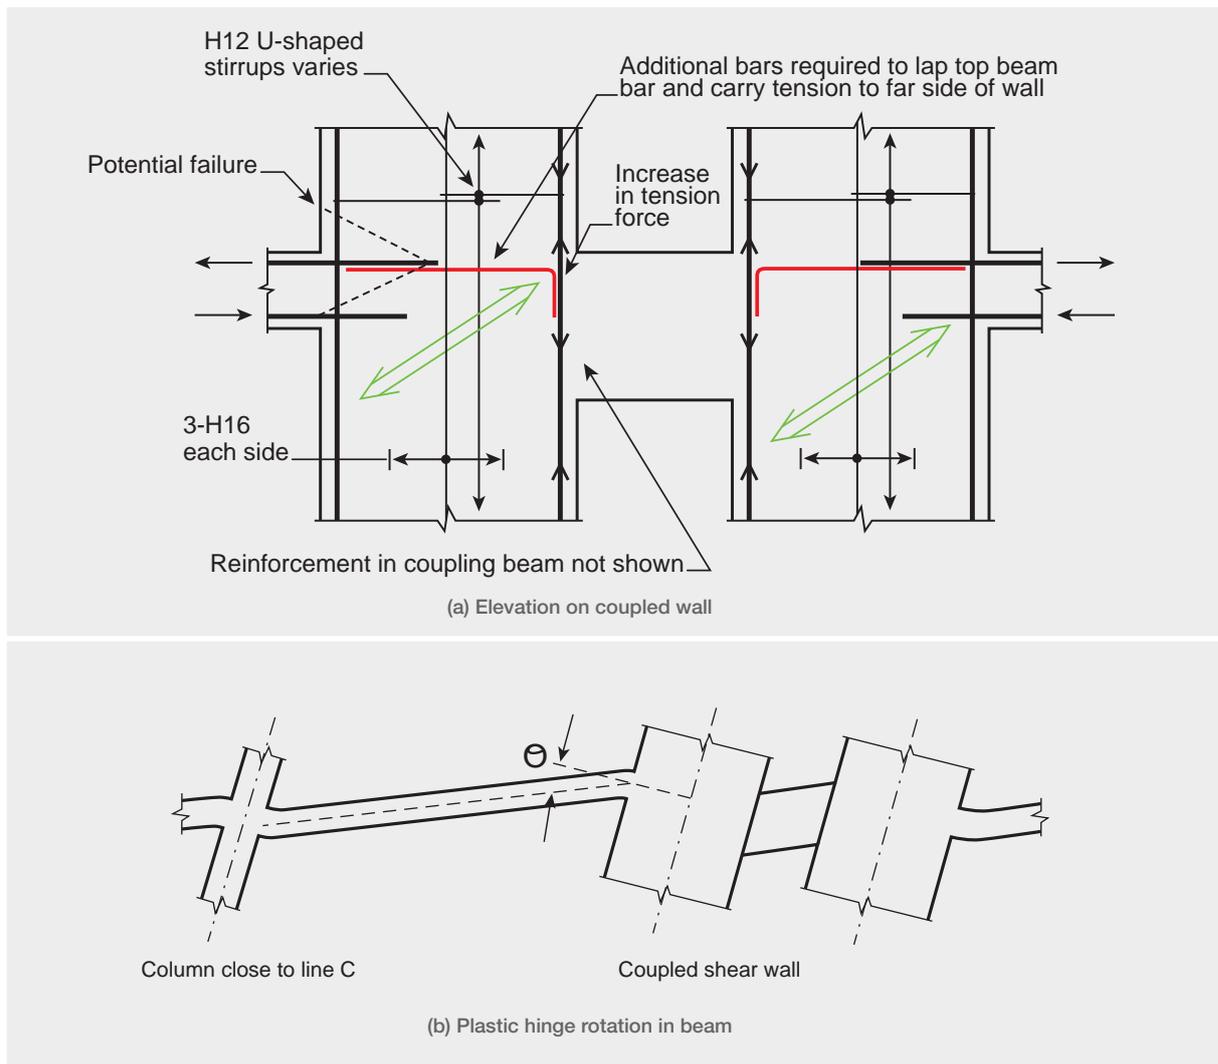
Coupled shear wall and anchorage of beams framing into the wall
